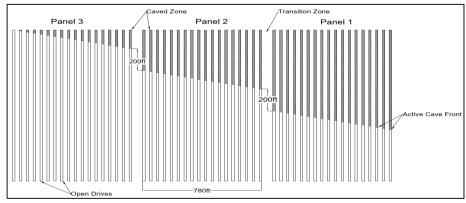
Conceptual Plan View Drawing of Pane Arrangements
